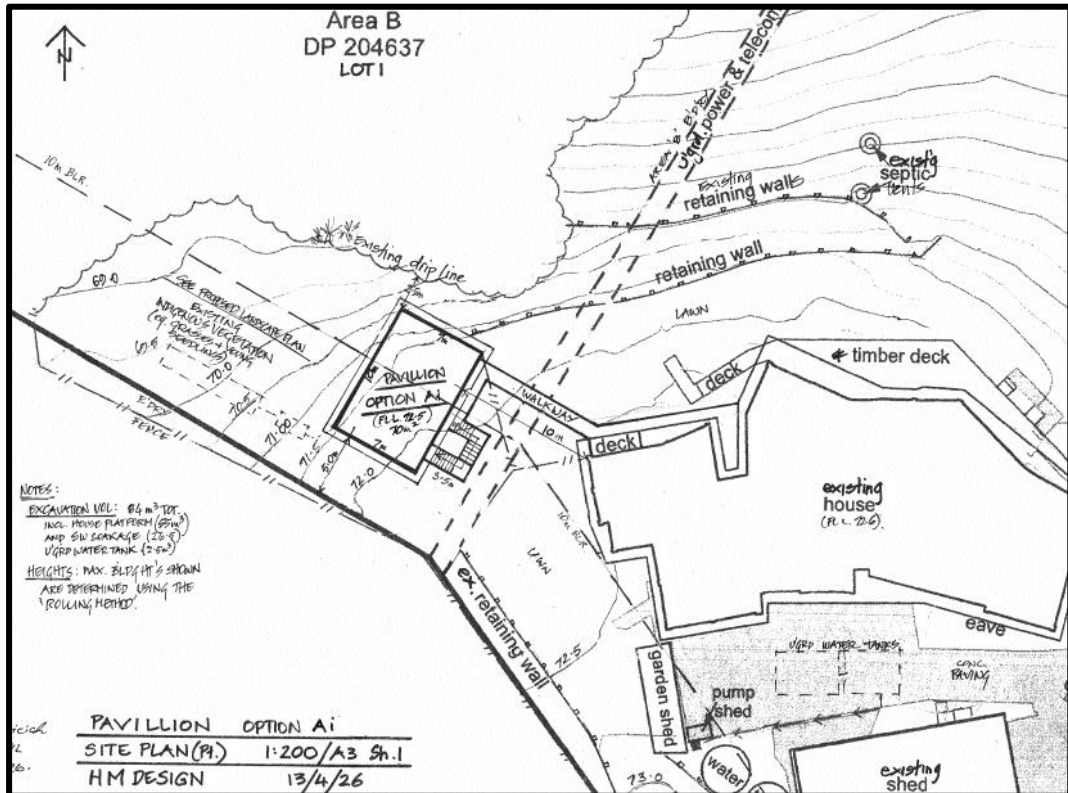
Site Plan showing location of pavilion in regard to existing dwelling on the site and bush areas.
